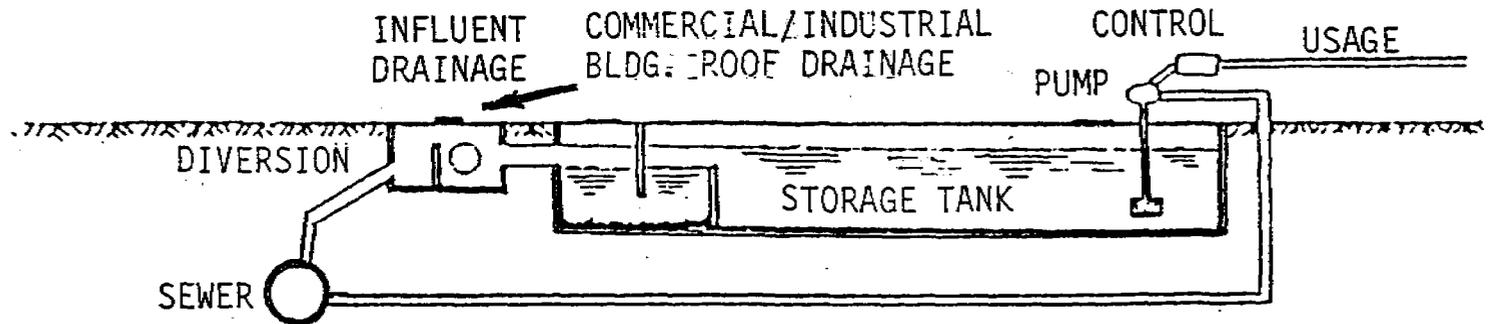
ROOF DRAINAGE HARVESTING FACILITY FOR COMMERCIAL AND INDUSTRIAL BUILDINGS
